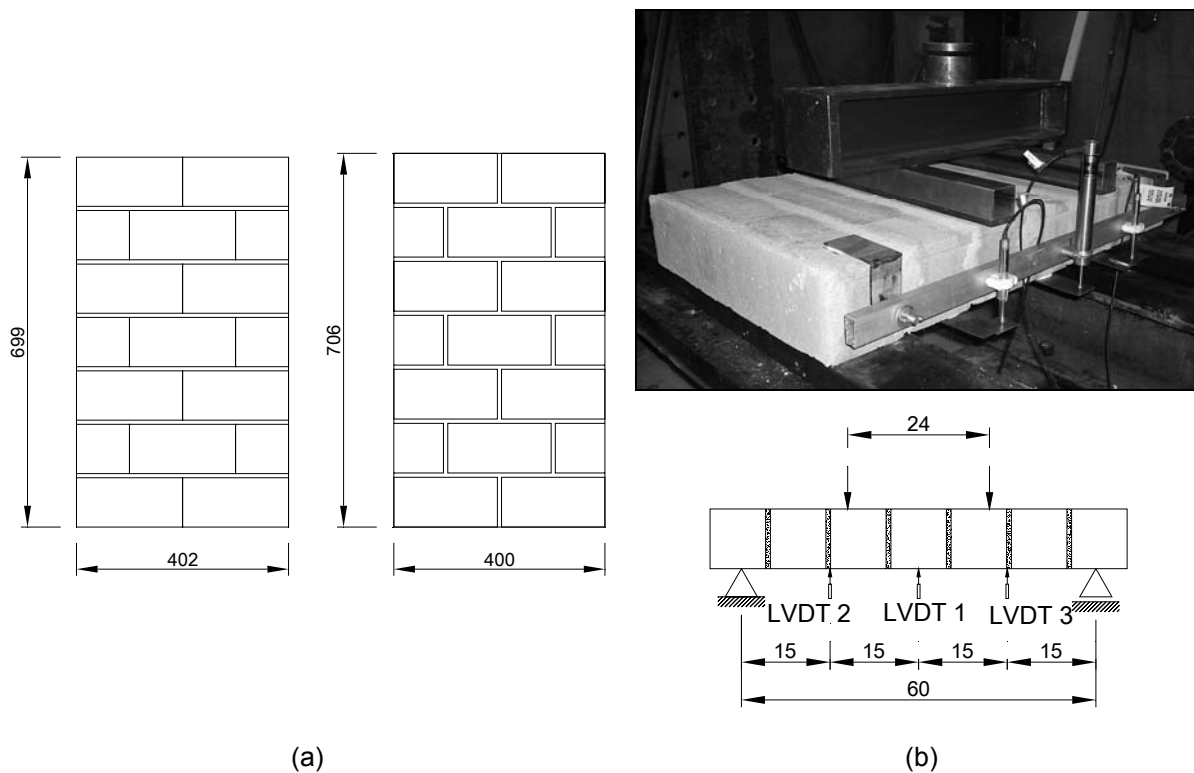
Flexural tests: (a) Specimens and (b) Test setup.
